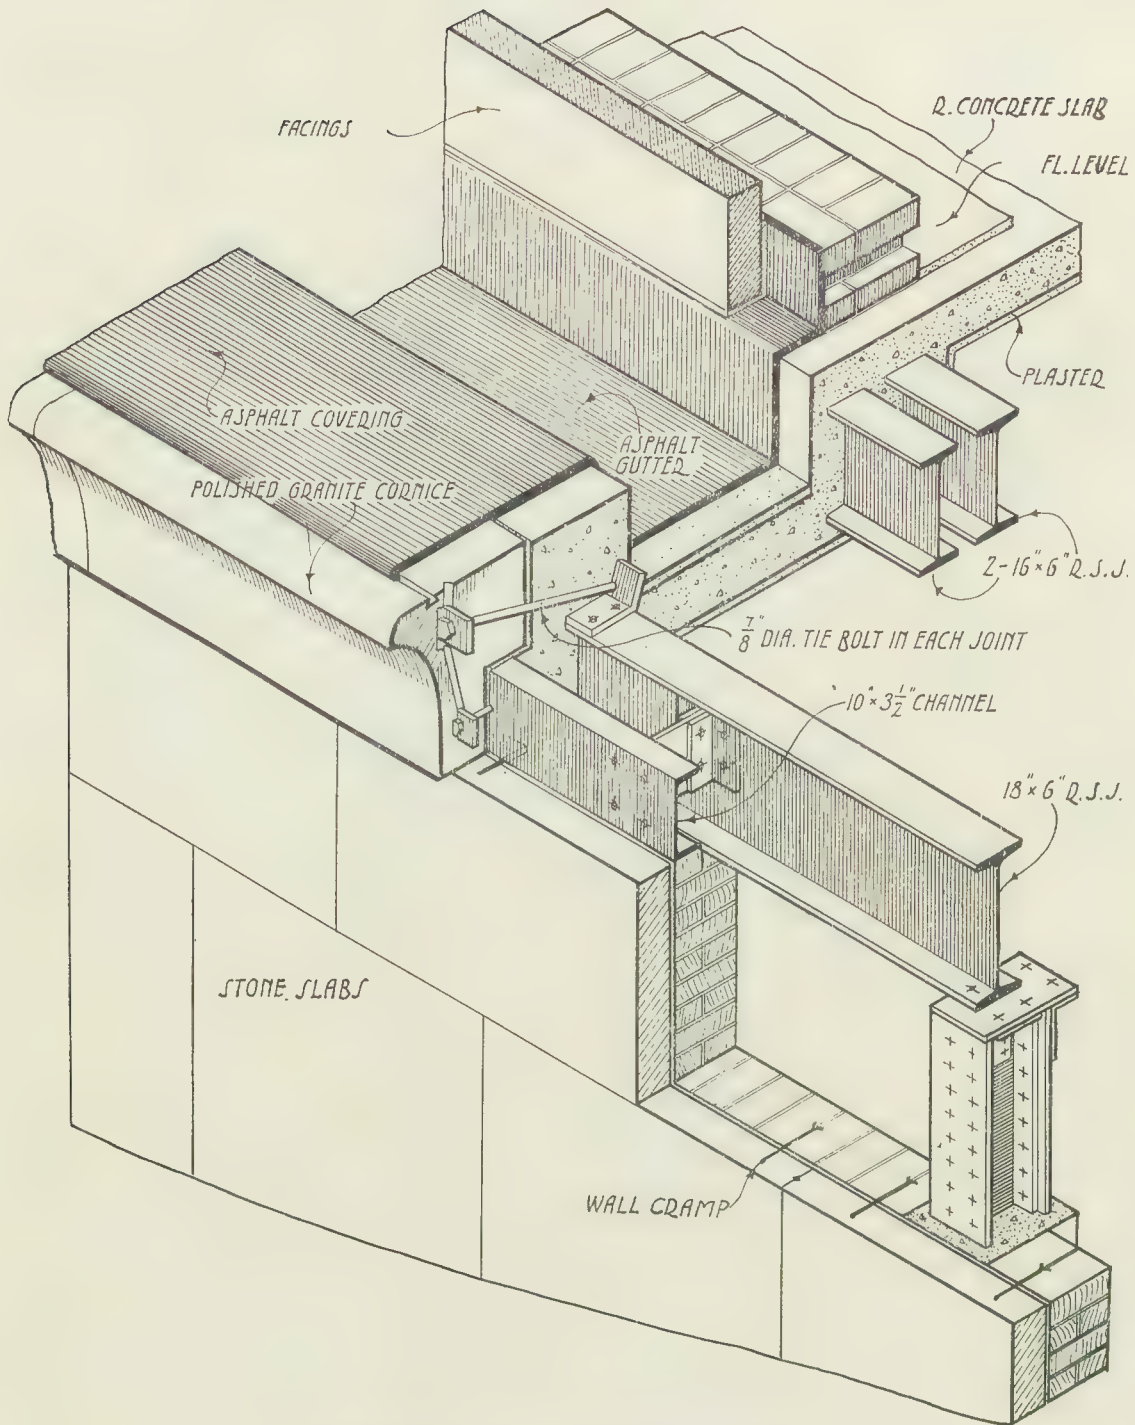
FINISH AT TOP OF A SLAB-FACED WALL
